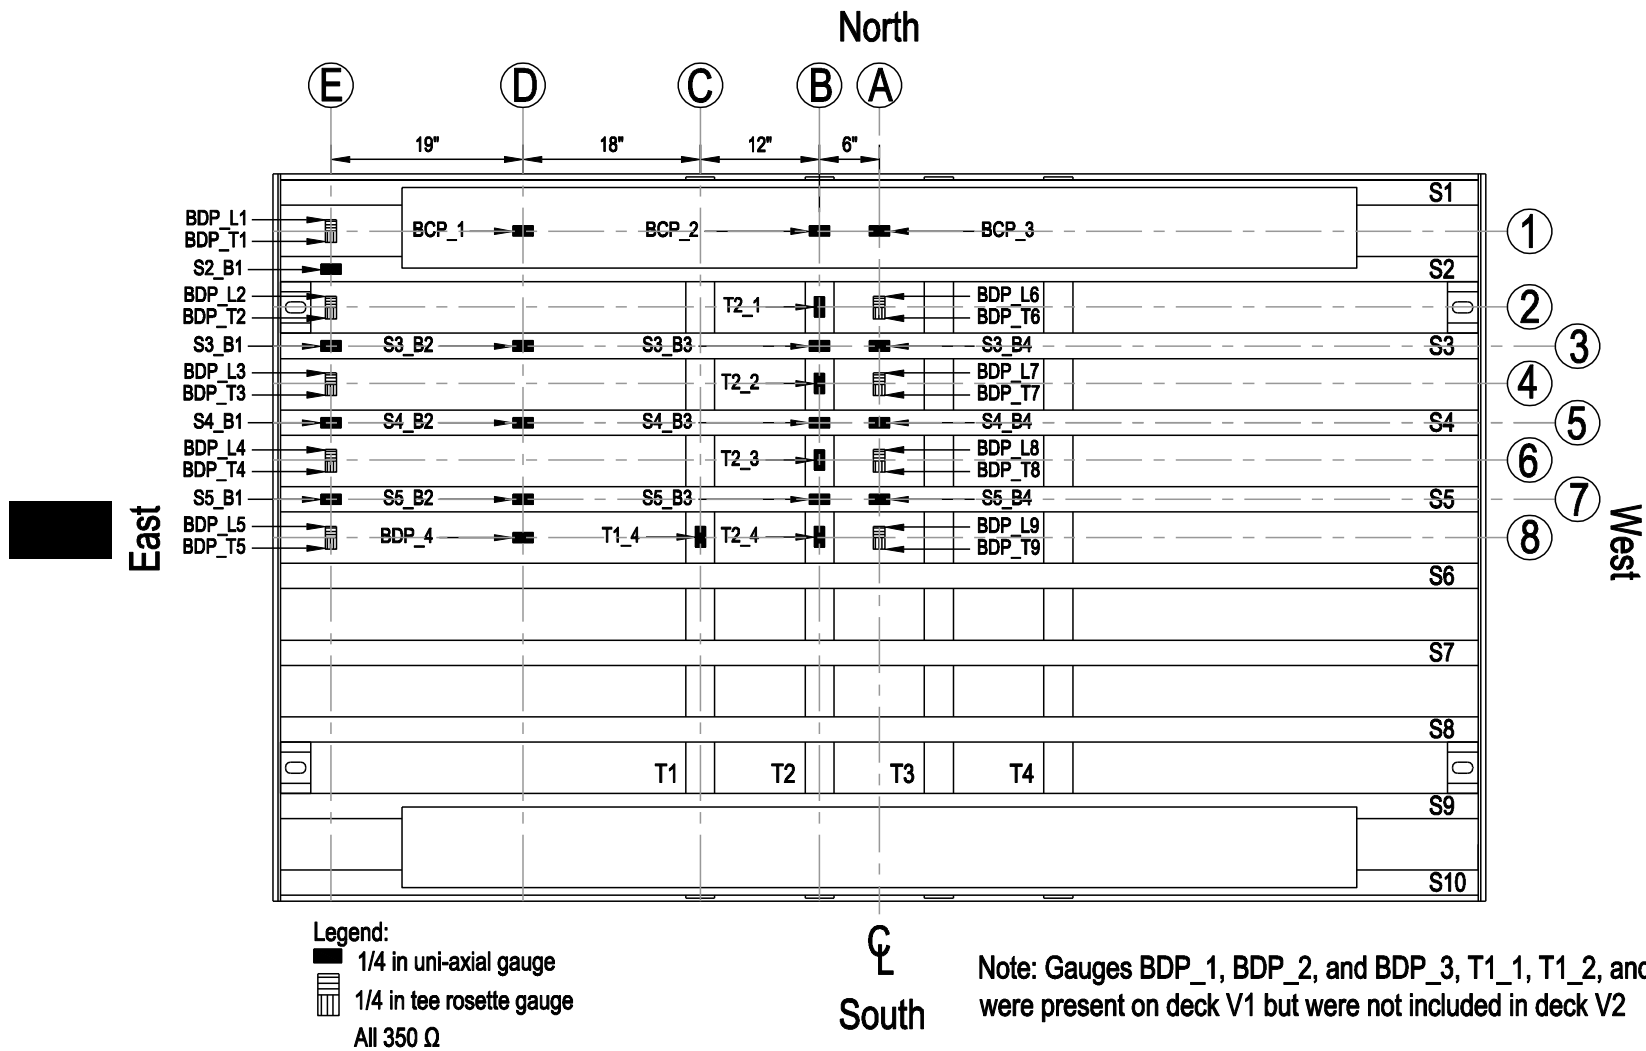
Strain gauge layout for Specimen #2 on bottom of deck plate
